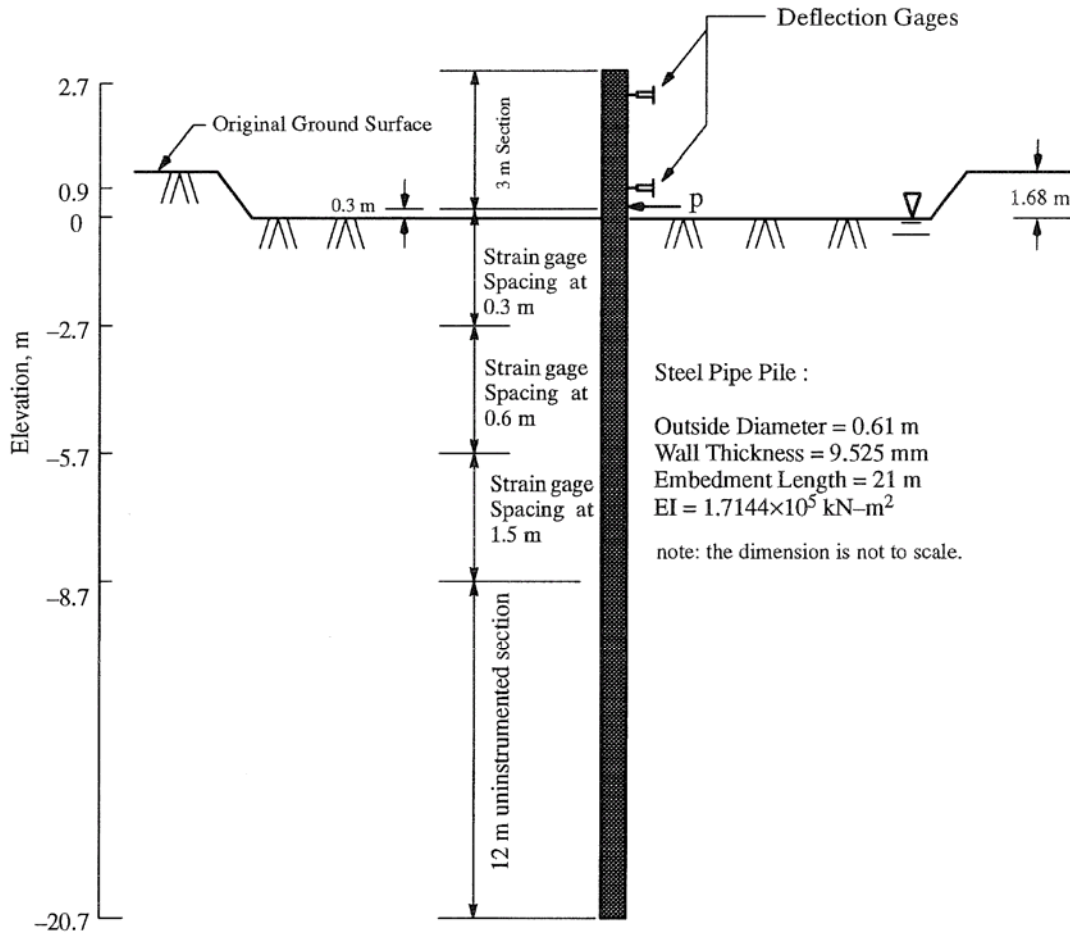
Lateral load test setup of a pile in cohesionless soil (after Fan, 1996)
